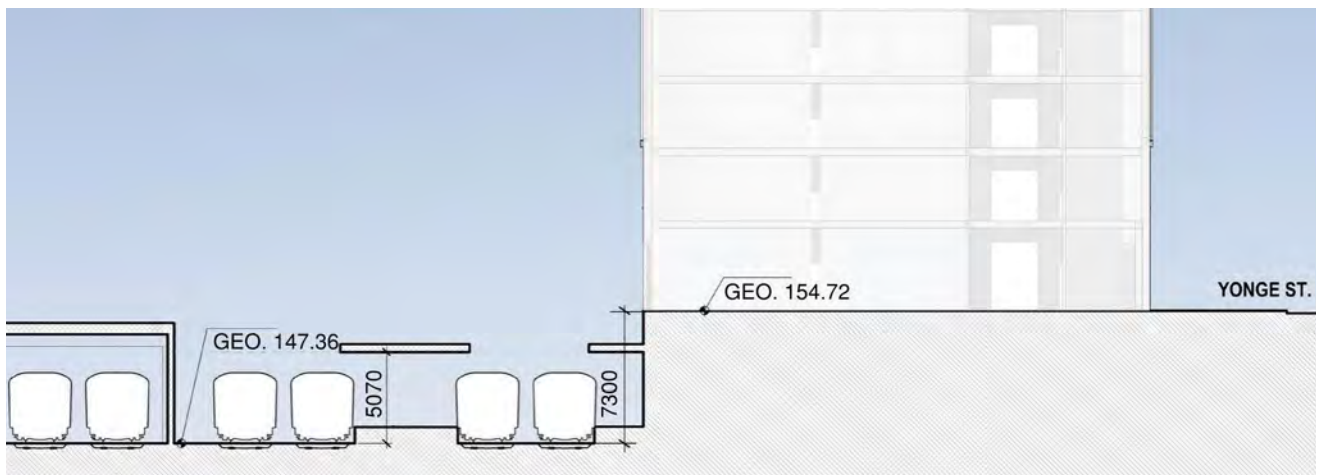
Site section 9- McBrien Building and Davisville Station platform
